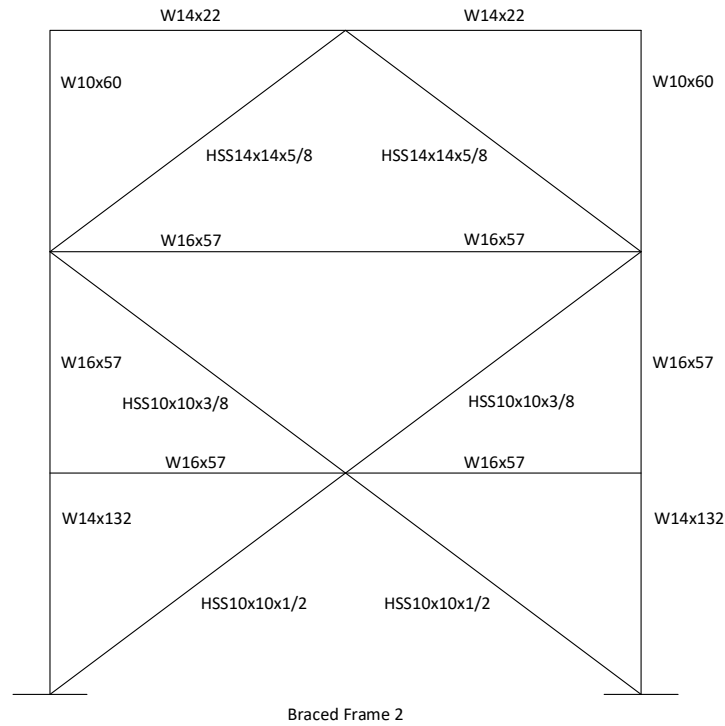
Calculated Sections for Braced Frame with Cross Bracing Configuration
